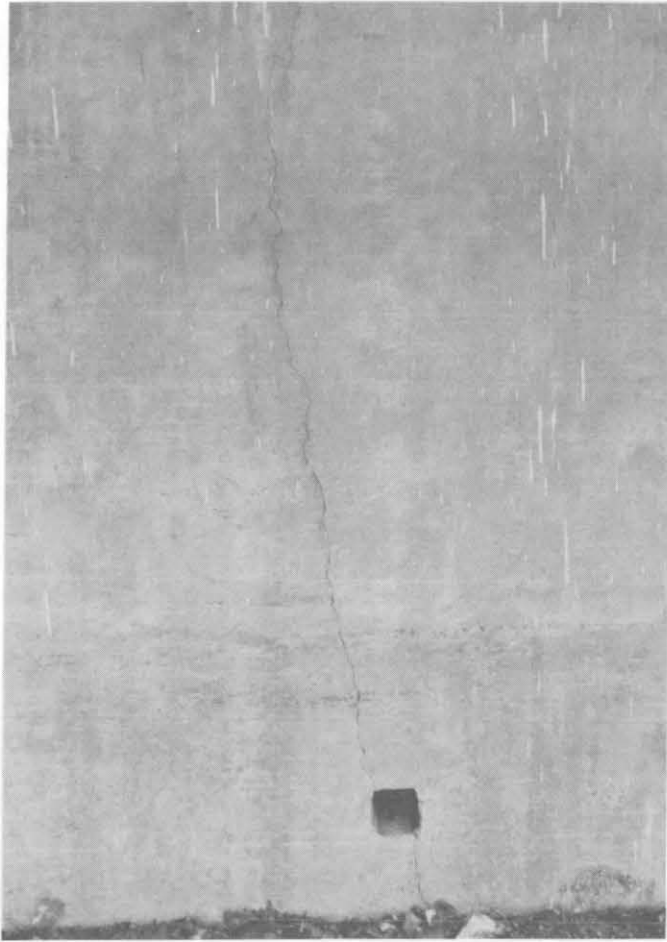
Minor cracking in abutment caused by differential settlement.
